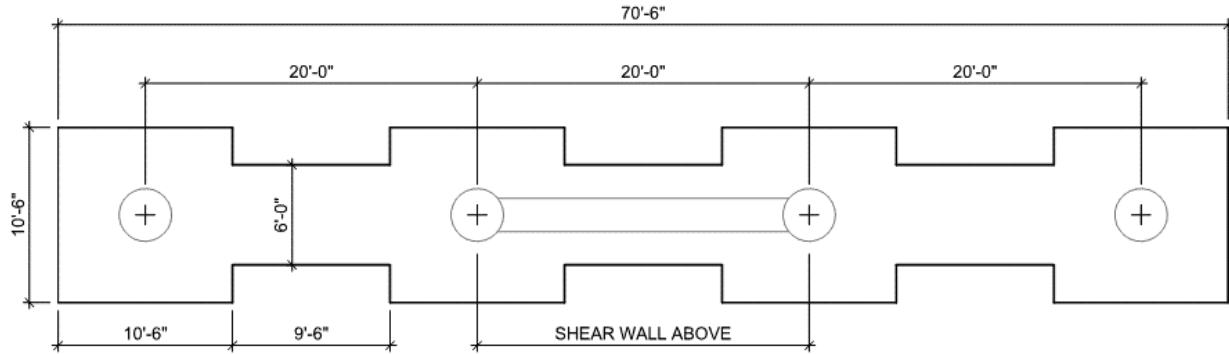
Foundation Plan: With Proposed Foundation Retrofit
